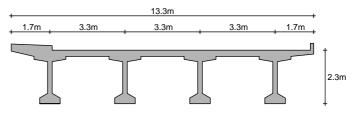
Section of the bridge deck, comprised of four precast, pretensioned I-beams and a cast-in-place deck slab
